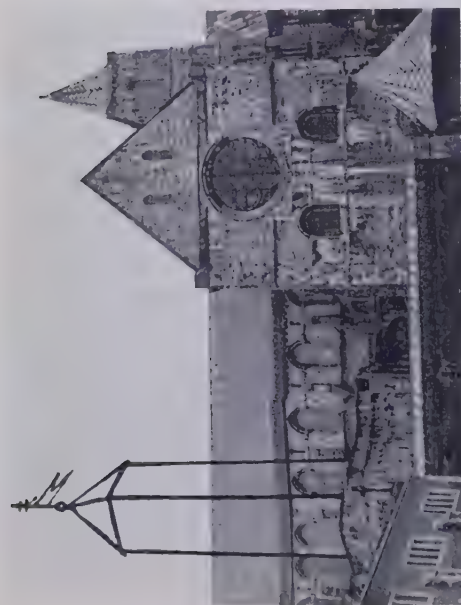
(right) The North Transept Tower from the south-west, showing the levelling courses at the completion of each arch construction, and other evidence of rebuilding.
